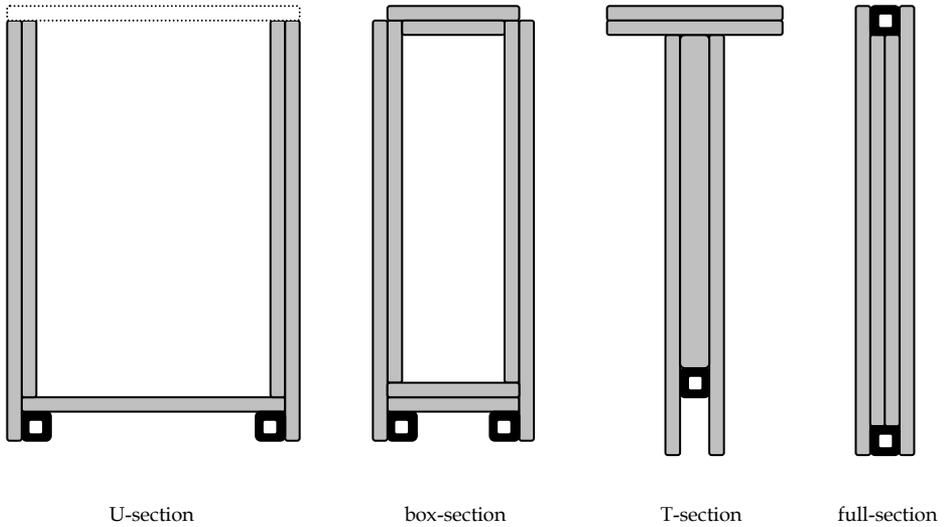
Alternative cross-section designs, developed at Delft University of Technology
